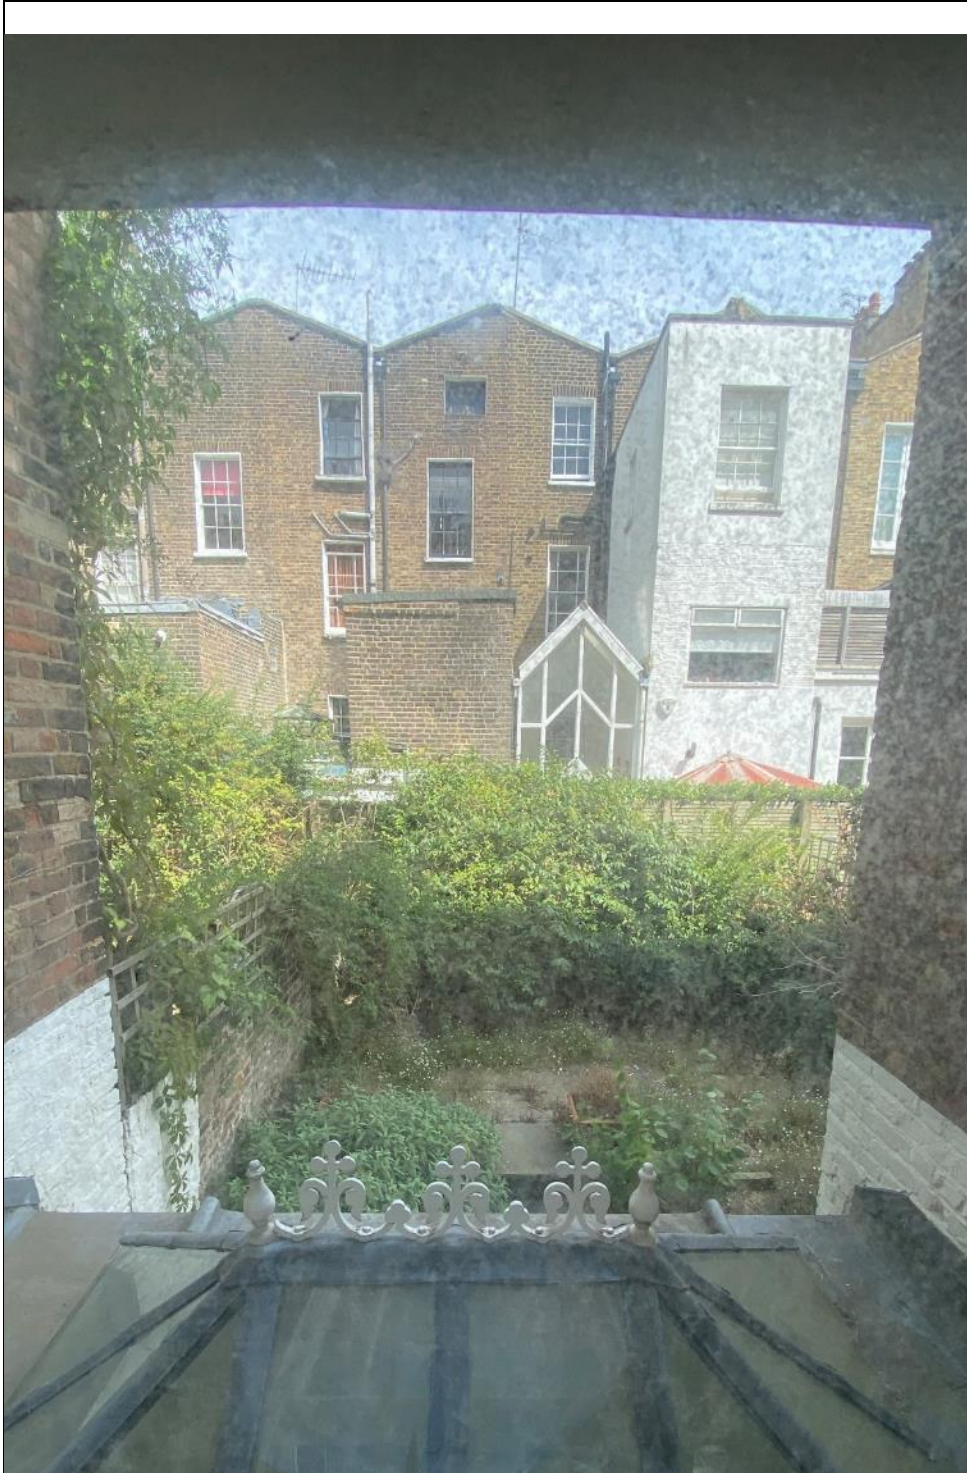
Ground Floor - View outwards of position of new balcony, east towards the rear gardens of Northumberland Place.
